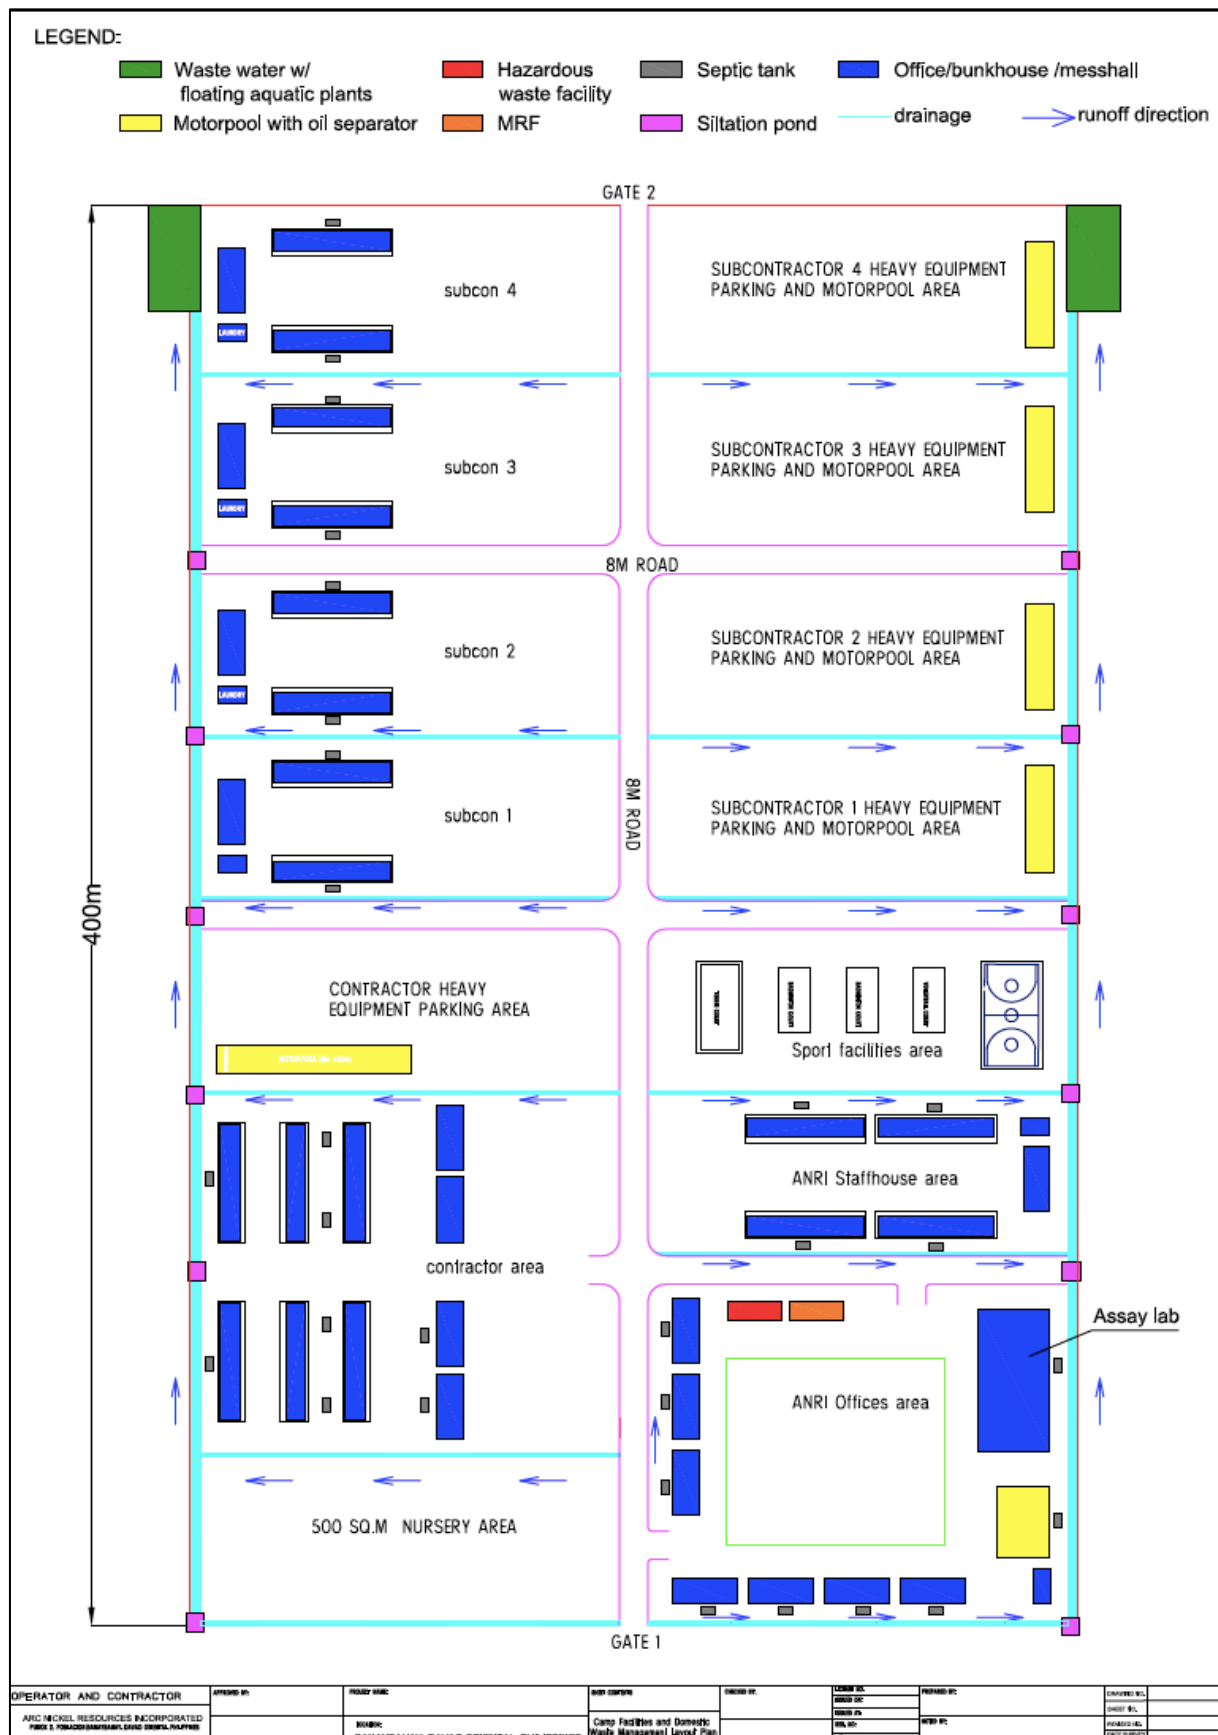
Design Layout of Campsite Facilities and Waste Management
